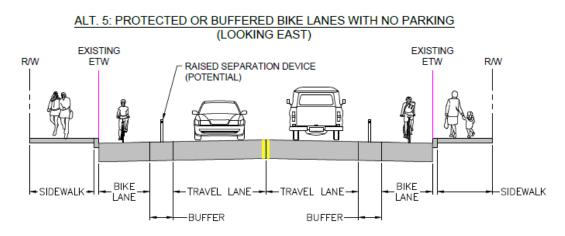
Coleman Avenue (City of Menlo Park) Alternative 5
